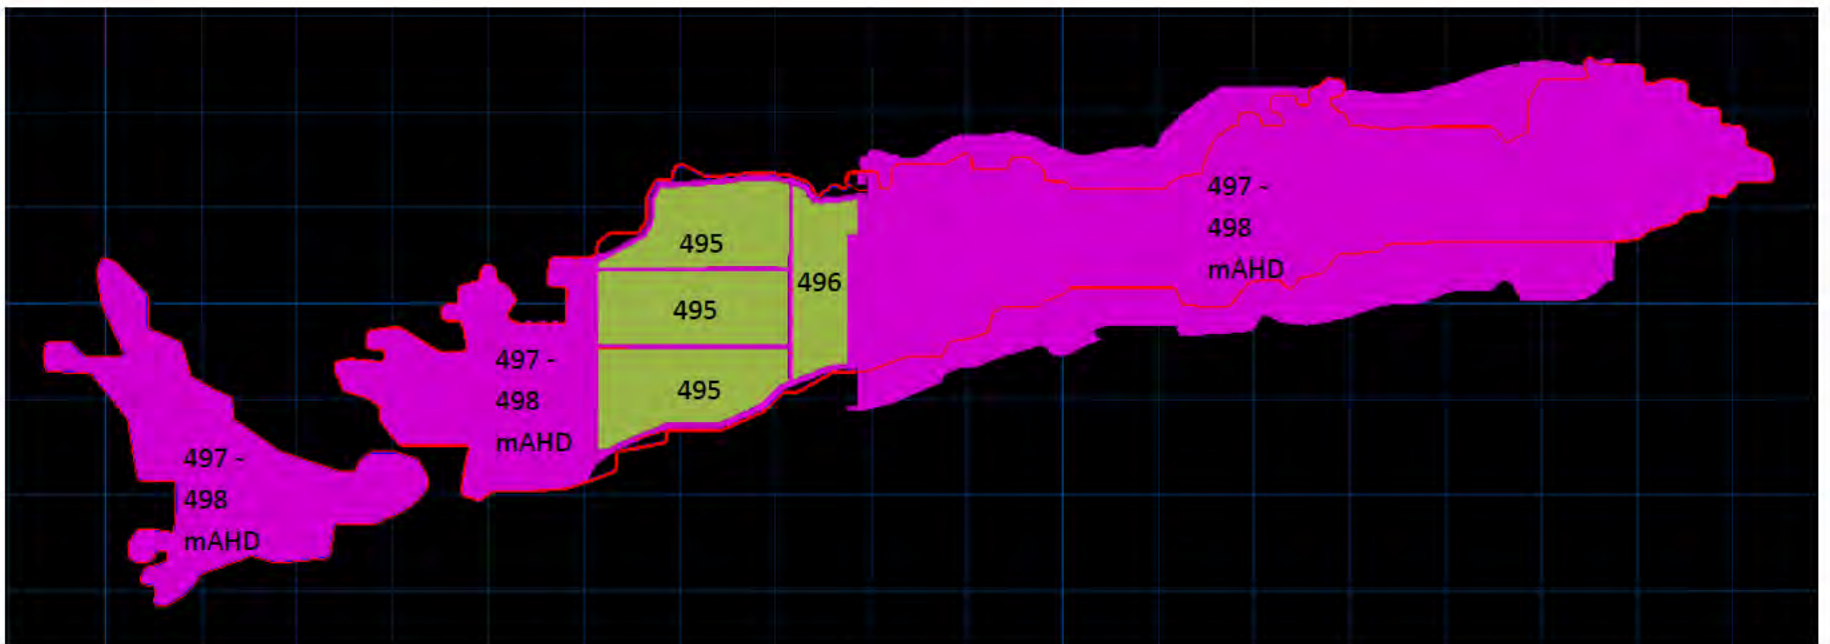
Sequence of mining, tailings deposition and mine pit backfilling at Year 20 (Milling completed around years 17 /18 and mining completed around yr 15 – Tailings deposition concluded with milling. Waste into pit voids and covering tailings ongoing)
